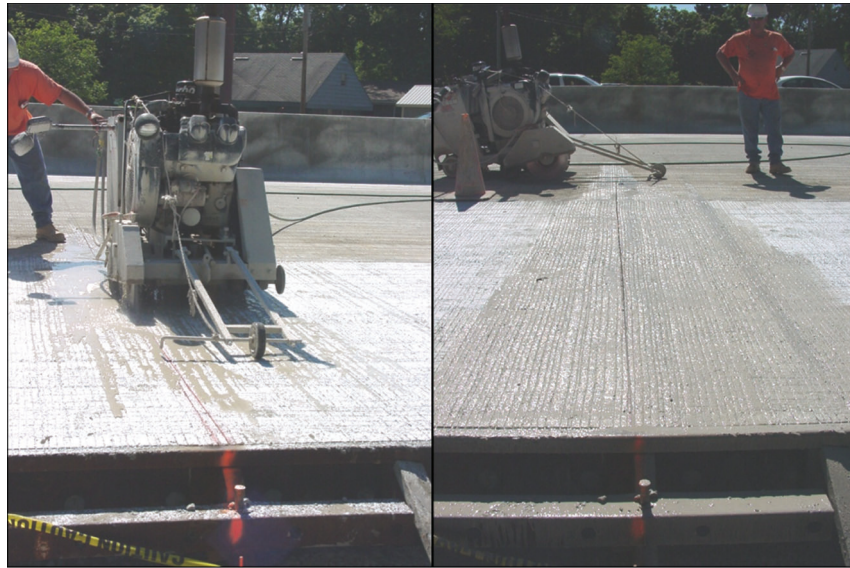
Joint saw cutting of the 14" thick and 18 foot joint spacing slabs (north)
